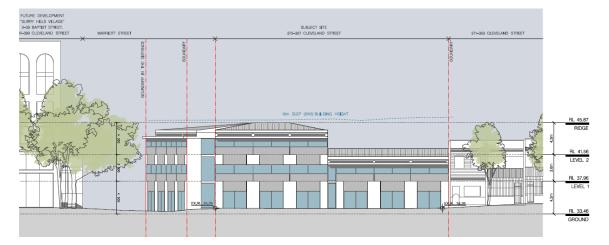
Pre-DA Scheme 1 - Cleveland Street Elevation
